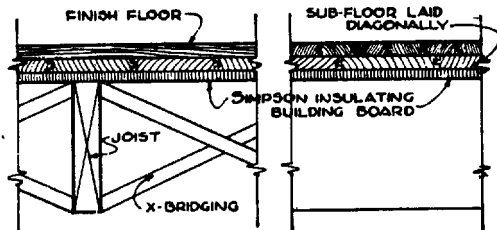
Fig. J. Simpson Insulating Building Board Applied Between Joists and Sub-Floor.
